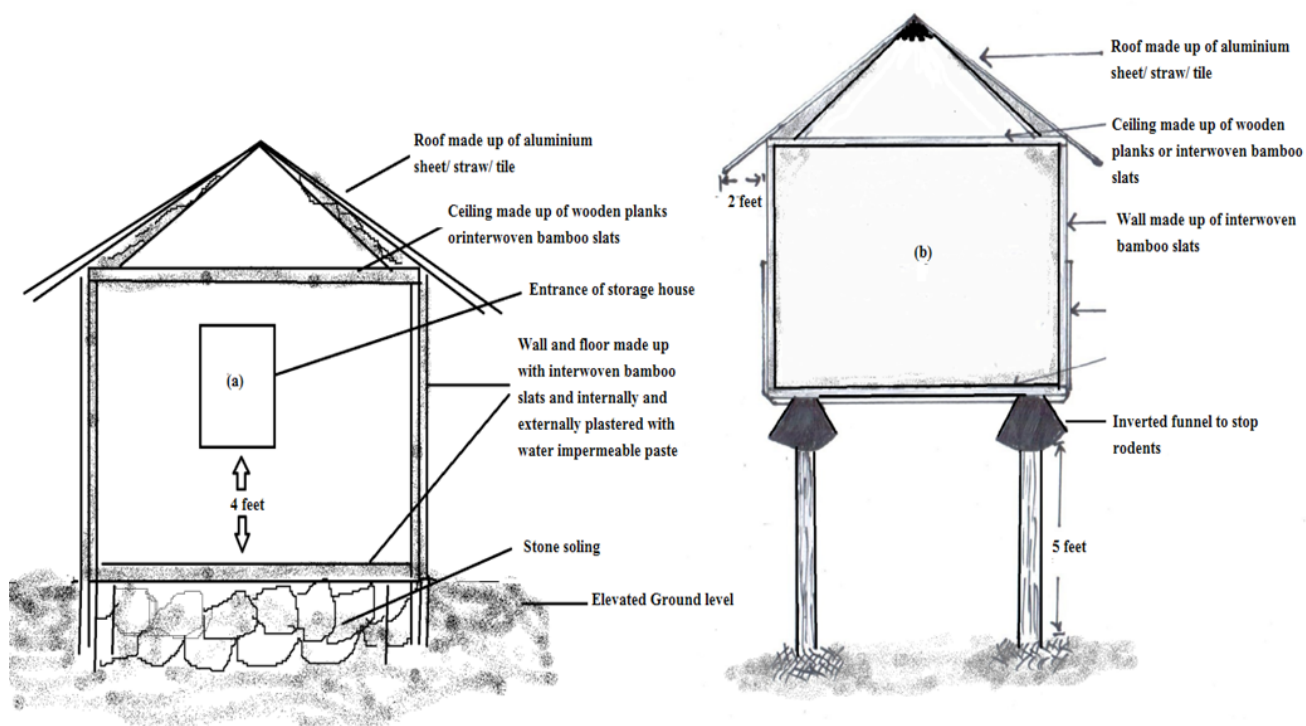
Diagrammatic representation of (a) Storage house constructed in higher elevation and (b) Storage house constructed with raised platform
